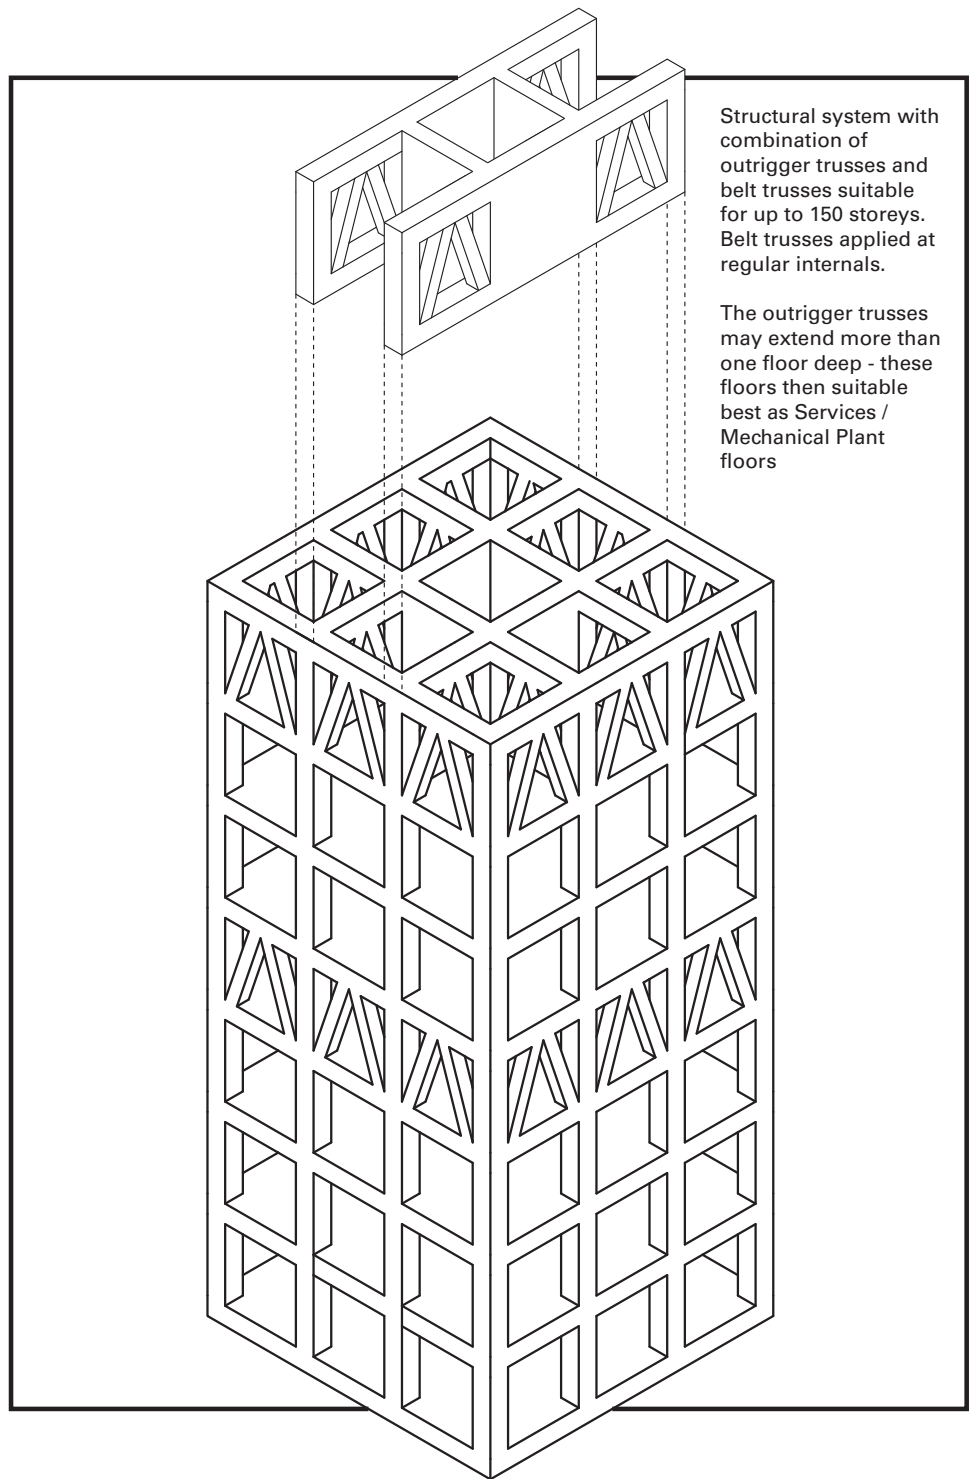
Outriggers tying together central shear wall core and perimeter columns. Additionally, surrounding belt trusses connect the peripheral columns
